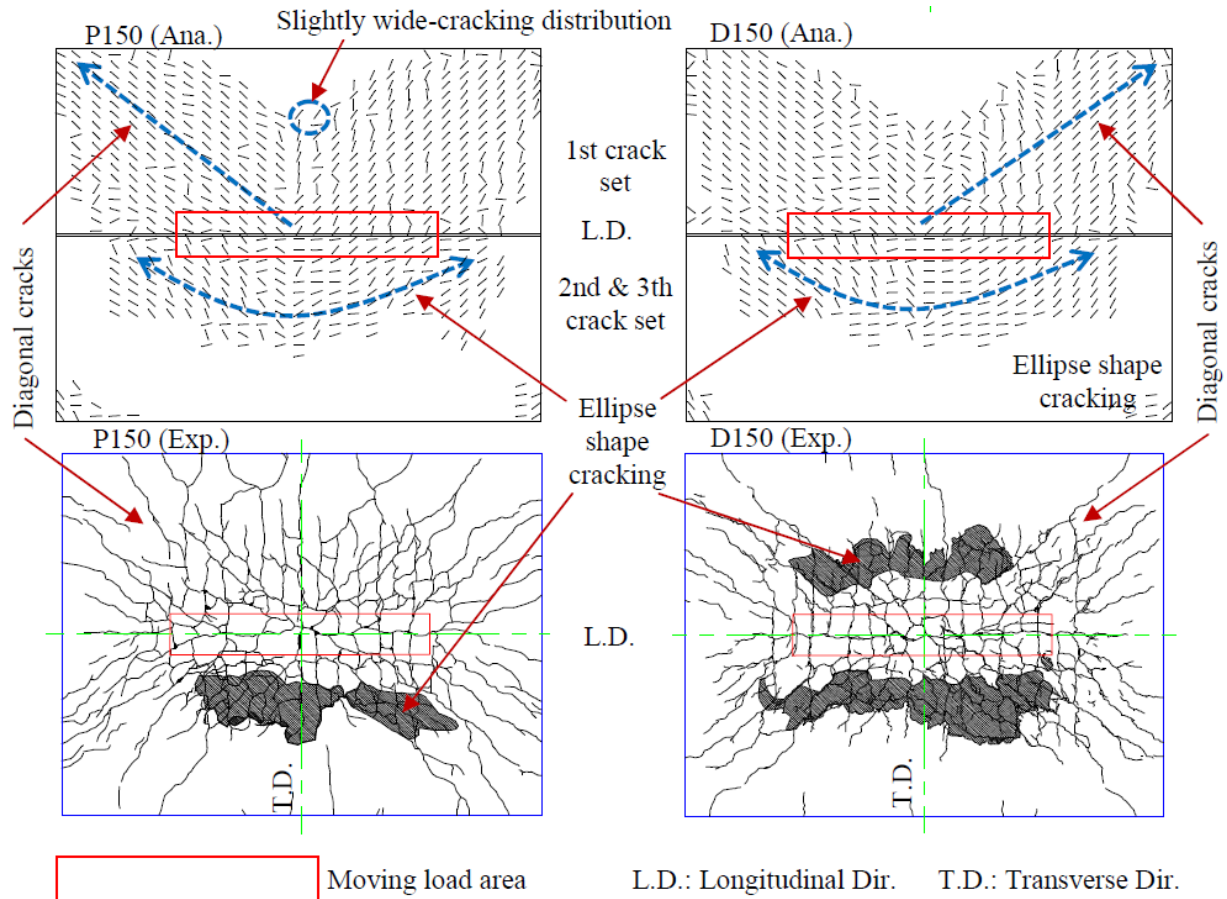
Cracking patterns at the bottom of the RC deck slab at the failure load (Drar and Matsumoto 2016)
